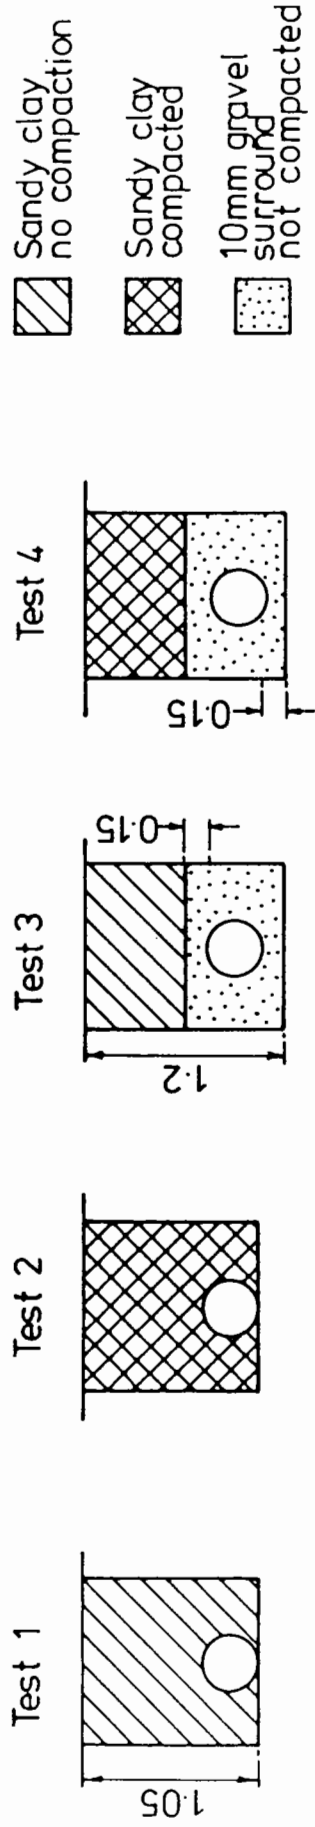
Schematic Layout of Test Pit at the TRRL (after Gaunt et al)
